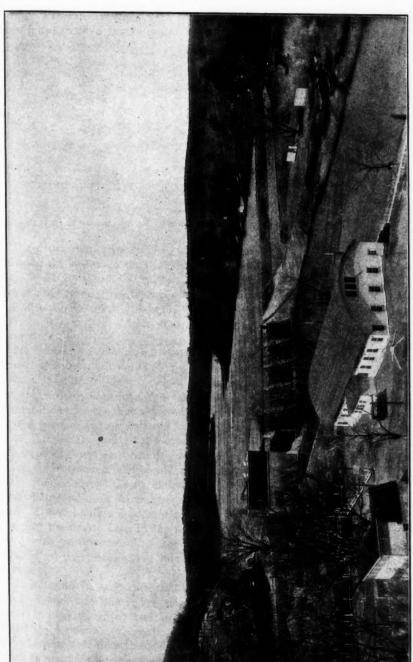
VIEW OF PINHOOK DAM AND POWER HOUSE.
